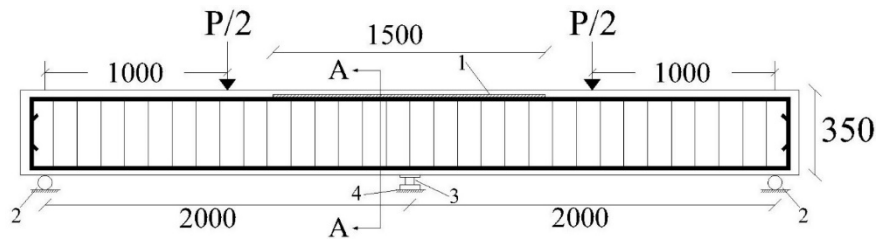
Test setup (all dimensions in mm). 1 - Steel plate / FRP laminate; 2 - roller support, 3 - load cell, 4 – hinged support
